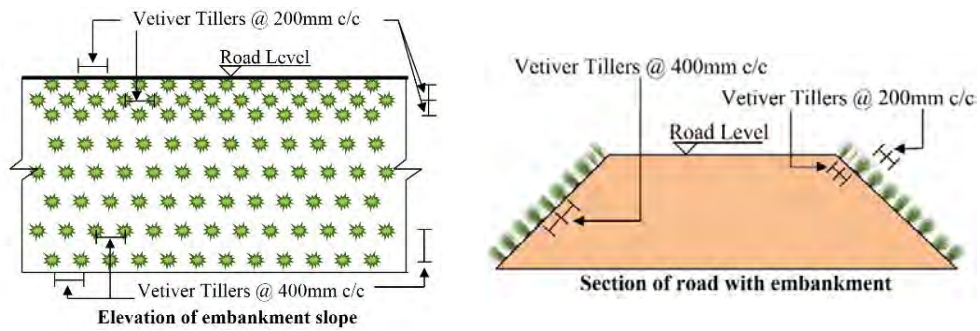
Vetiver plantation at embankment slope: elevation (left) and section (right)
